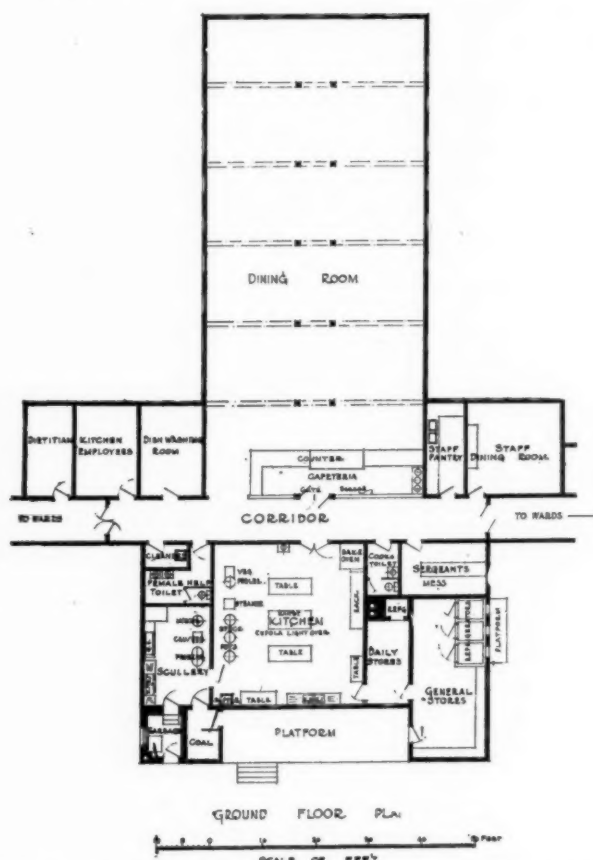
Ground floor plan of the Military Hospital at Fredericton, N. B., Canada.
